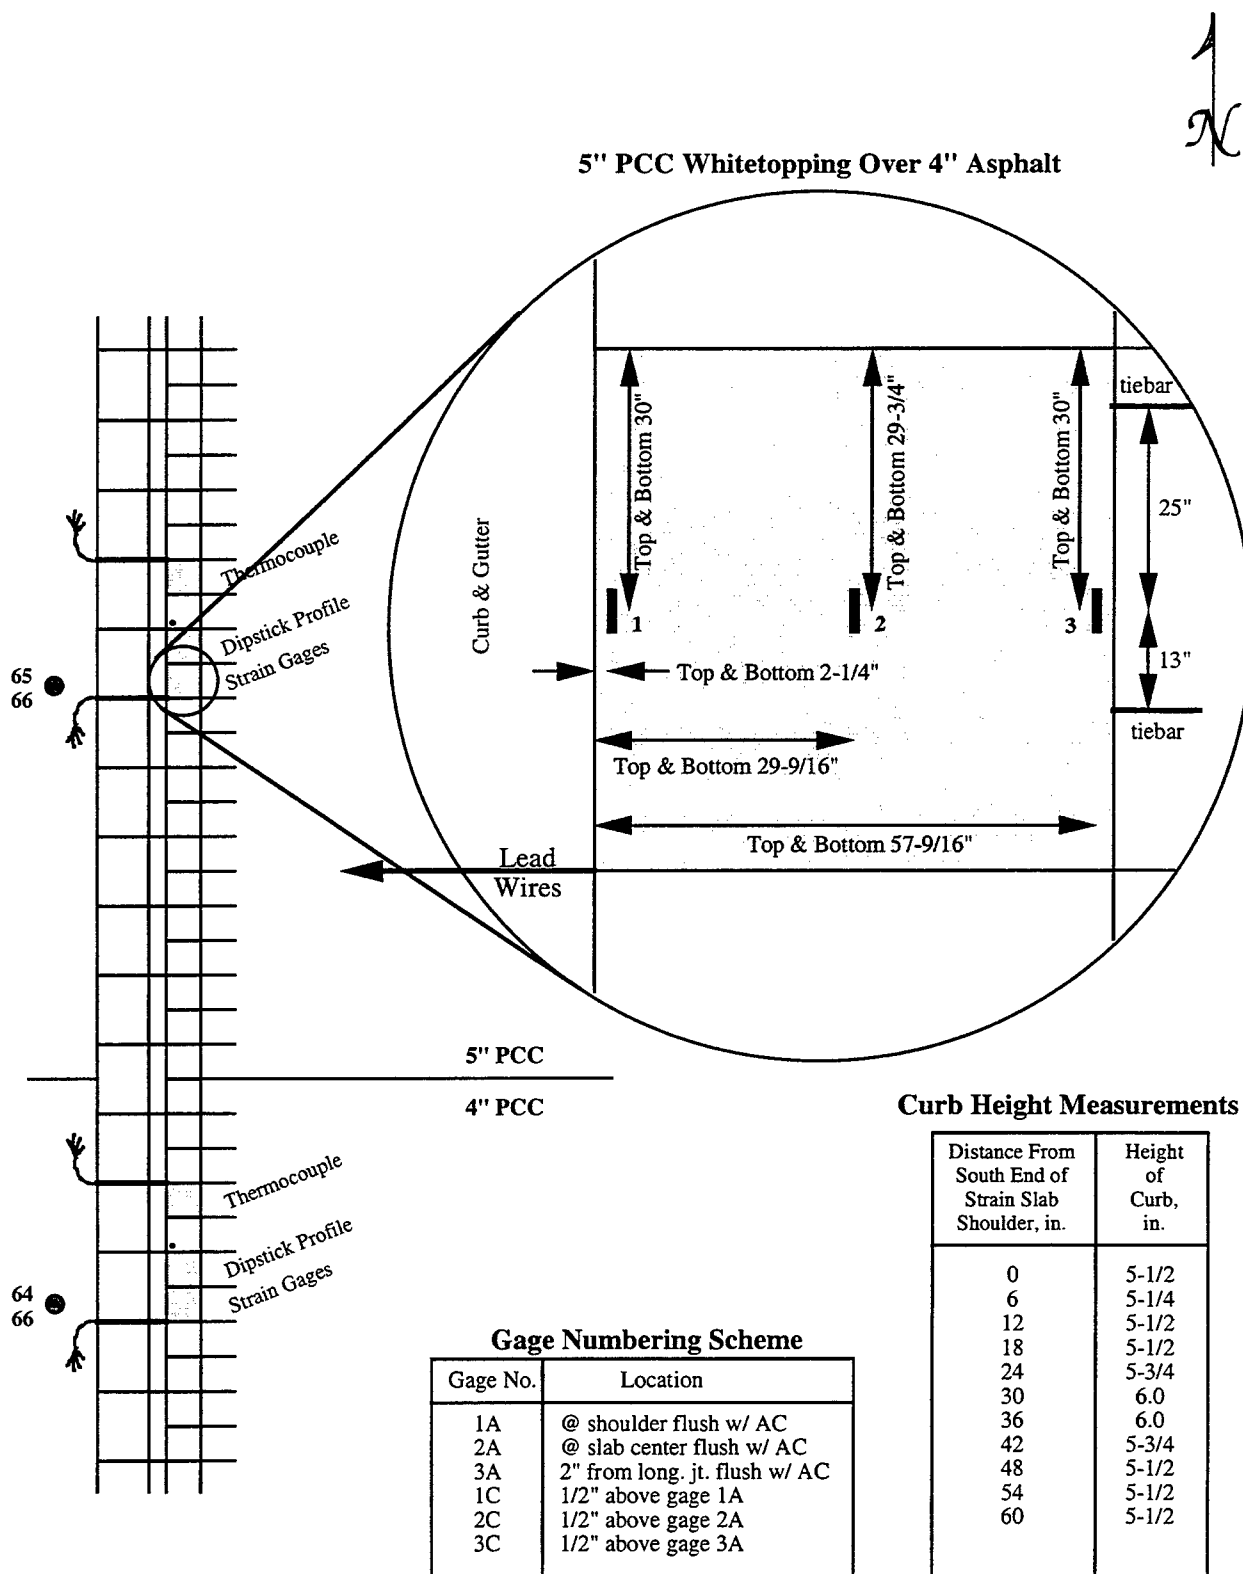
Test Slab 1 Layout for CDOT Project #1.
